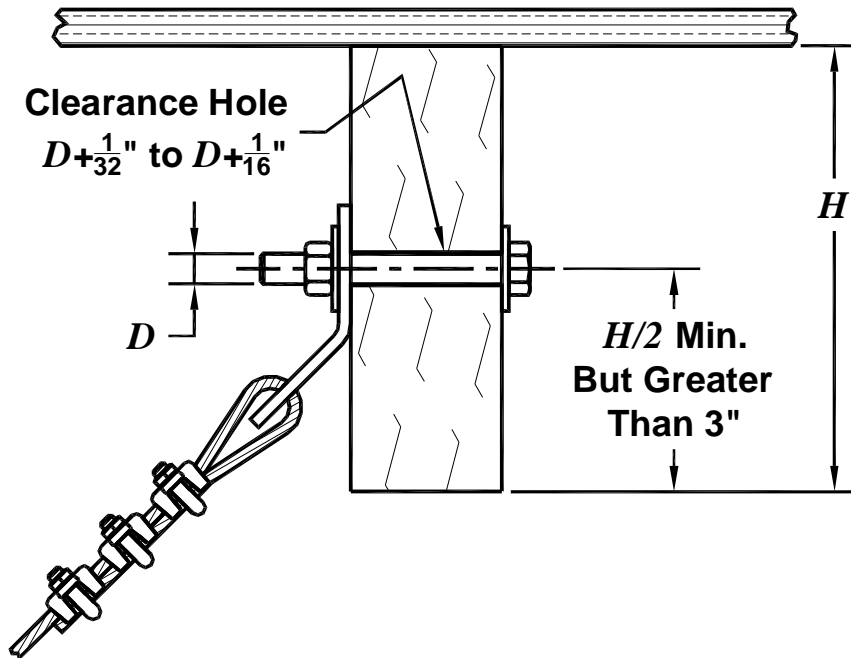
; KSCC Attached to a Wooden Joist or Beam in Orientation 2 Using a Through Bolt
